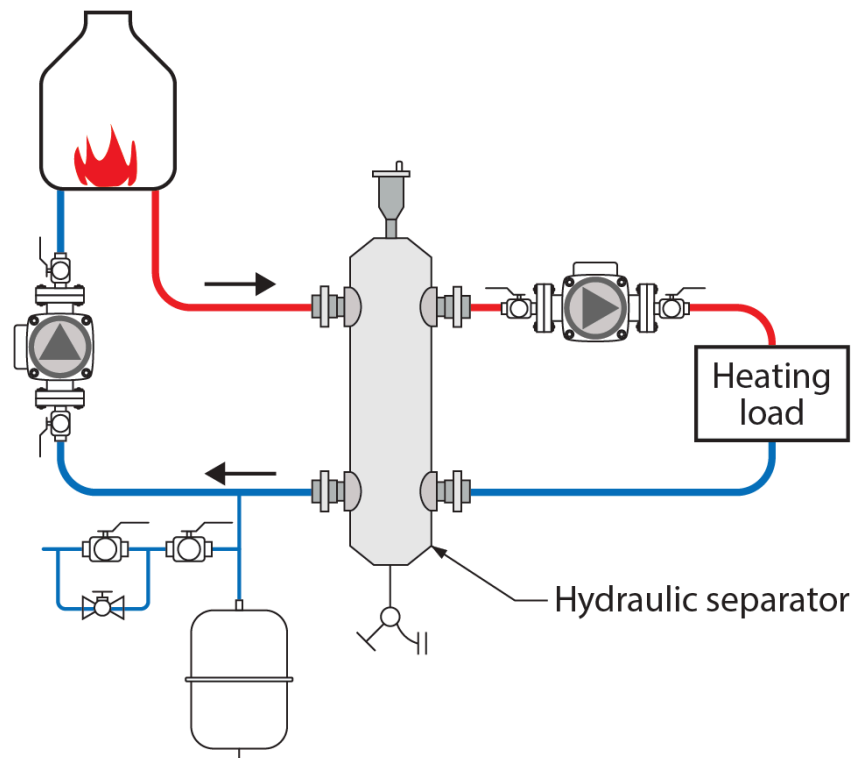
Hydraulic separator piping arrangement. (Skilled Trades BC, 2021) Used with permission.
